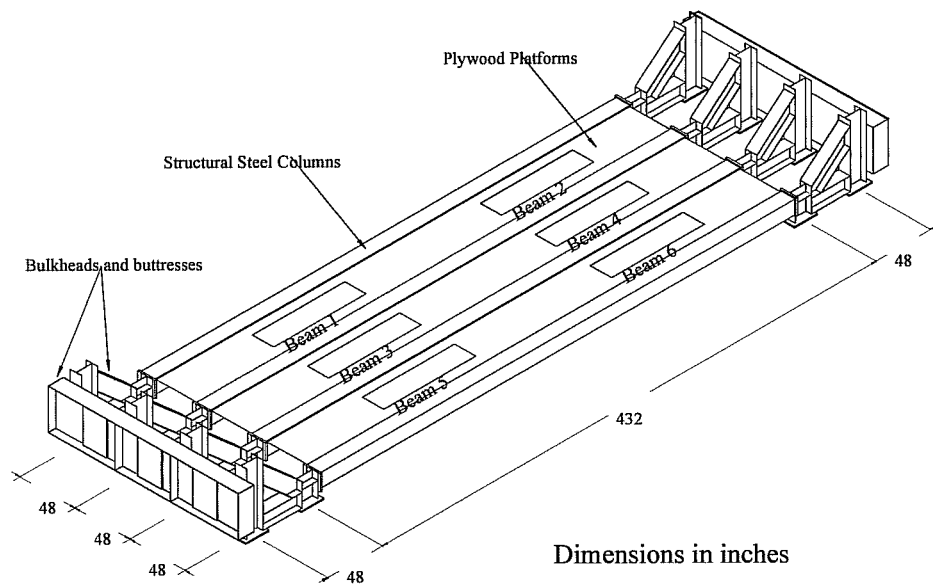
Prestressing Facility at Ferguson Laboratory
